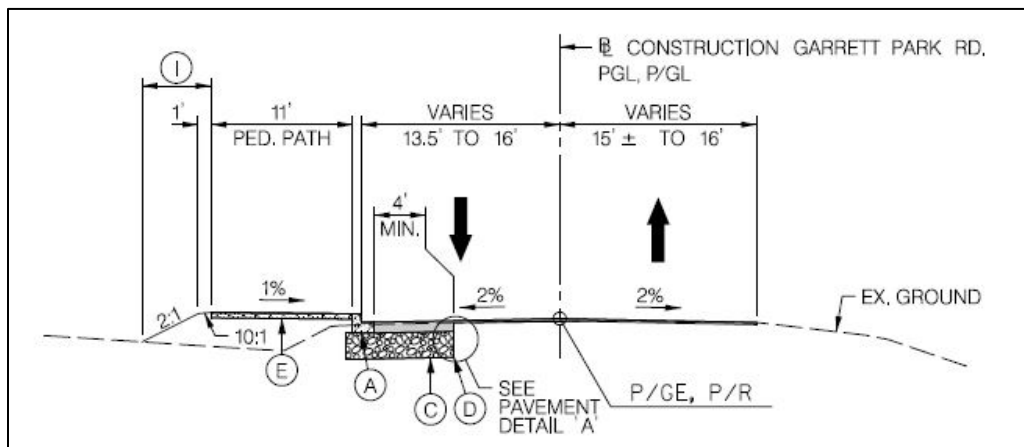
Proposed Typical Cross Section Design – Stations 15+20 to 16+45
